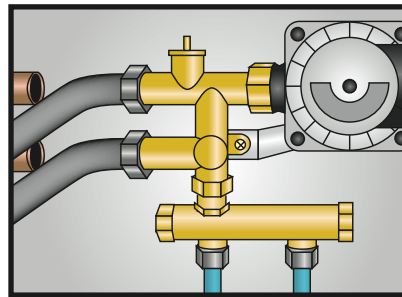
Connecting the pump to a circuit of two pipes, using a double outlet adaptor
